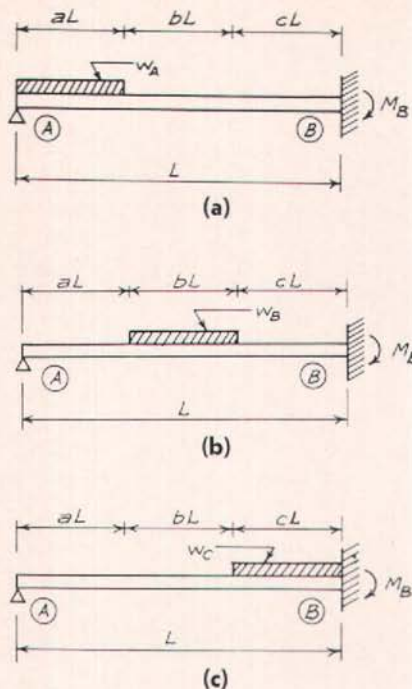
Three Loading Conditions for Uniform Load Applied to a Propped Cantilever Beam
